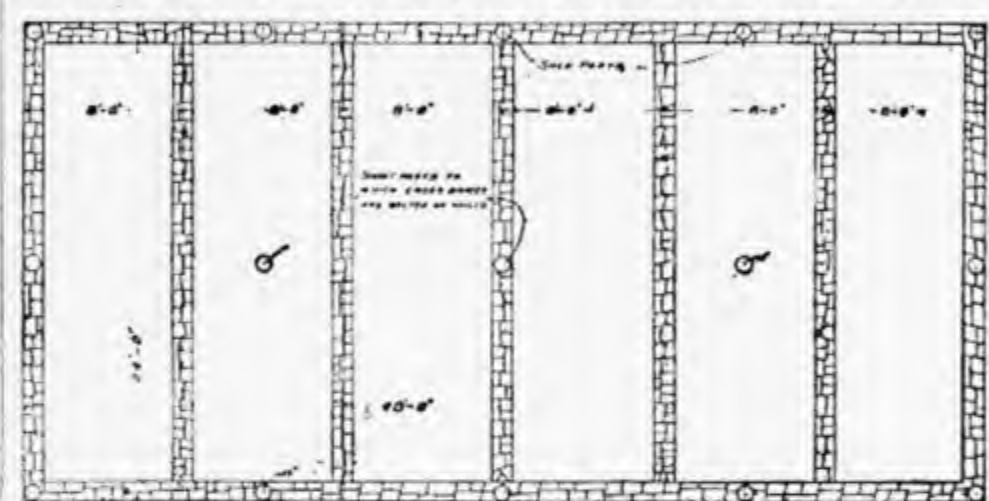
Ground Plan—Walls Do Not Extend Lengthwise of Shed, as Shown in Plan, But the Spaces Between Cross-Walls Are Left Open for Ventilation.
